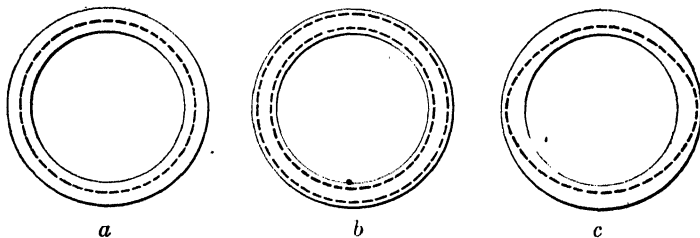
Reinforced concrete pipe. Three positions for mesh reinforcement: a, One layer to resist internal pressure; b, two layers for great depths or high internal pressure; c, one layer to resist external pressure.
